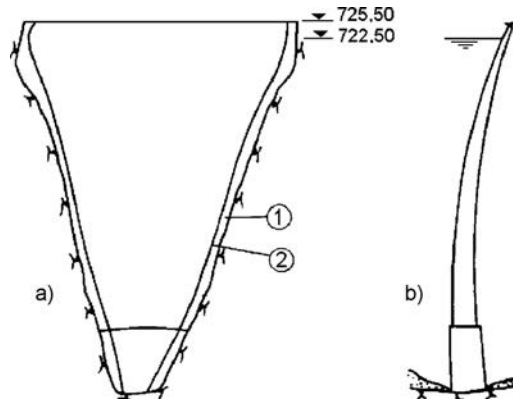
Vaiont dam, Italy (after ICOLD, 1974). (a) Elevation; (b) transverse section. (1) Concrete support; (2) interface of the dam with the concrete support.
